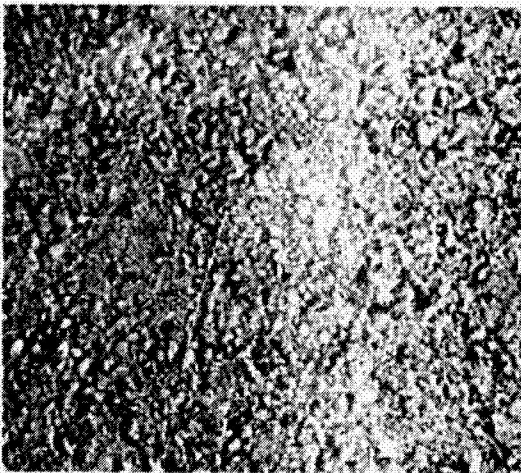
PHOTOGRAPH OF PAVEMENT SURFACE IN RUNWAY TEST ZONE. (MARCH 14-15 TESTS)
